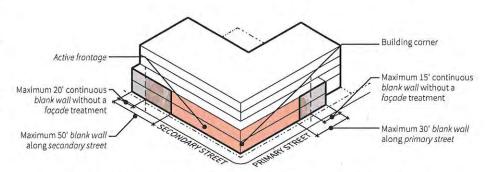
Blank façades at the pedestrian level must be less than 30 feet along primary streets and 50 feet along secondary streets.
